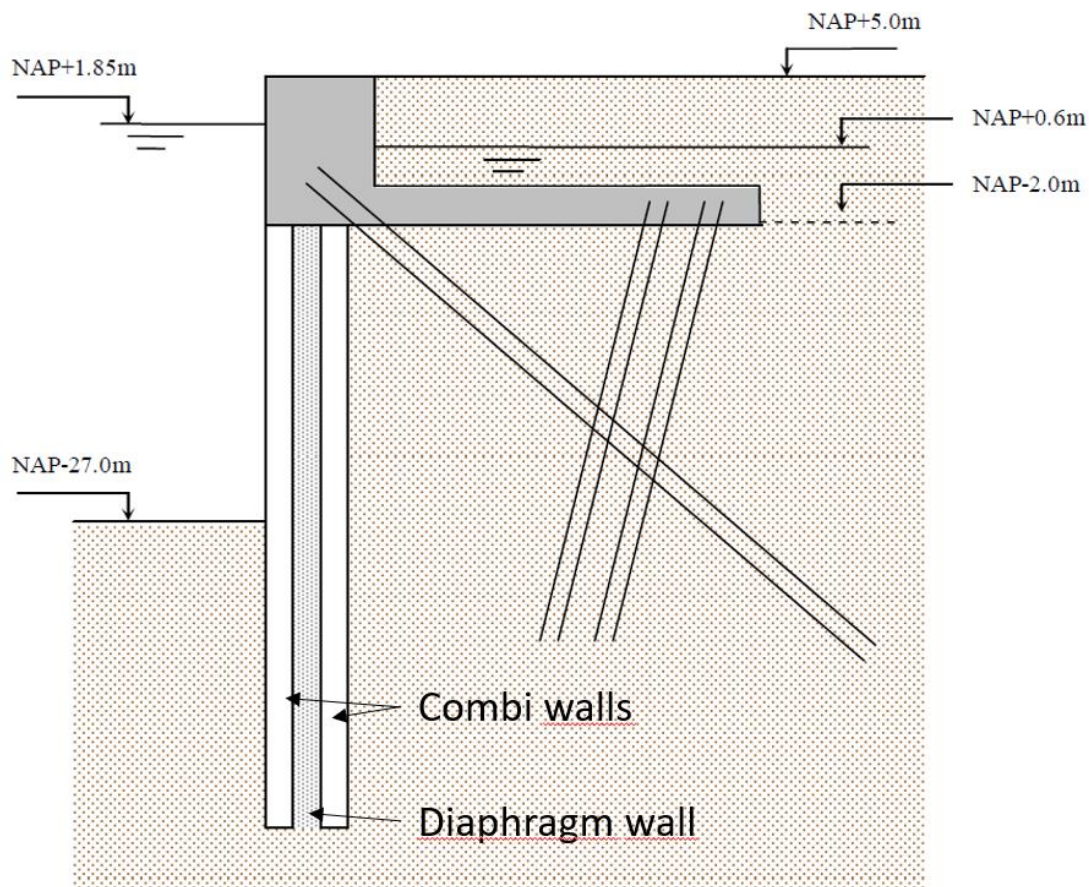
Cross section of a sandwich wall (Bonte, 2007).
